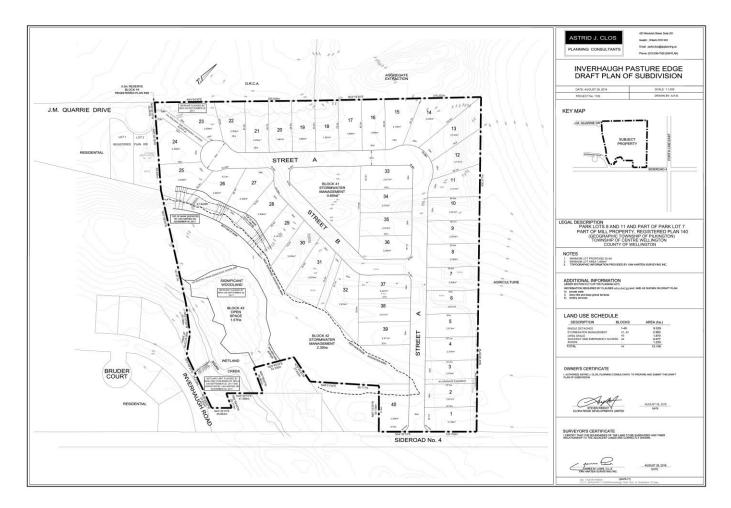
Draft Plan of Subdivision (August 28, 2018)
